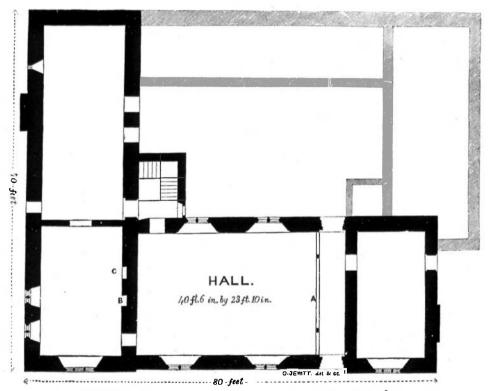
PLAN OF SUTTON COURTENAY MANOR HOUSE IN 1840.
